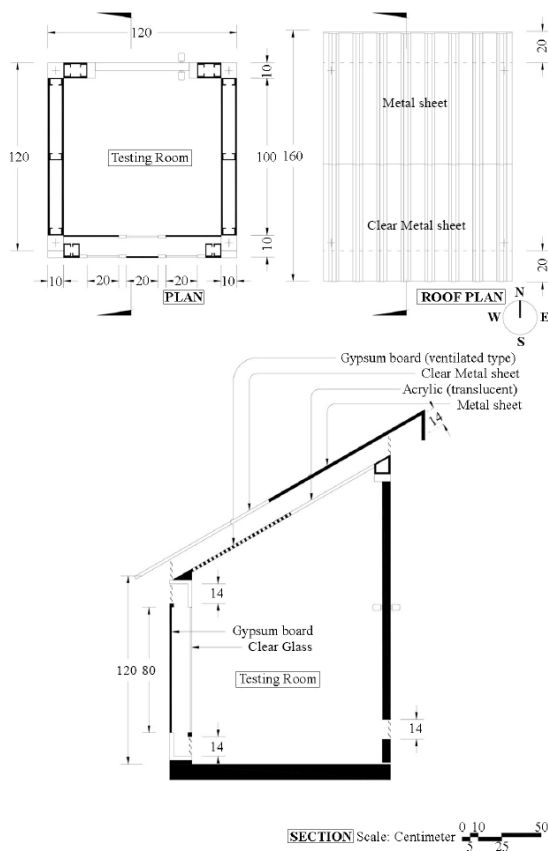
Show Model of the 3rd house model, Solar Chimney Wall with Daylighting (SC-WD), tested with Solar Chimney Metal Sheet Roof with Perforated Ceiling (SC-MSRPC)
